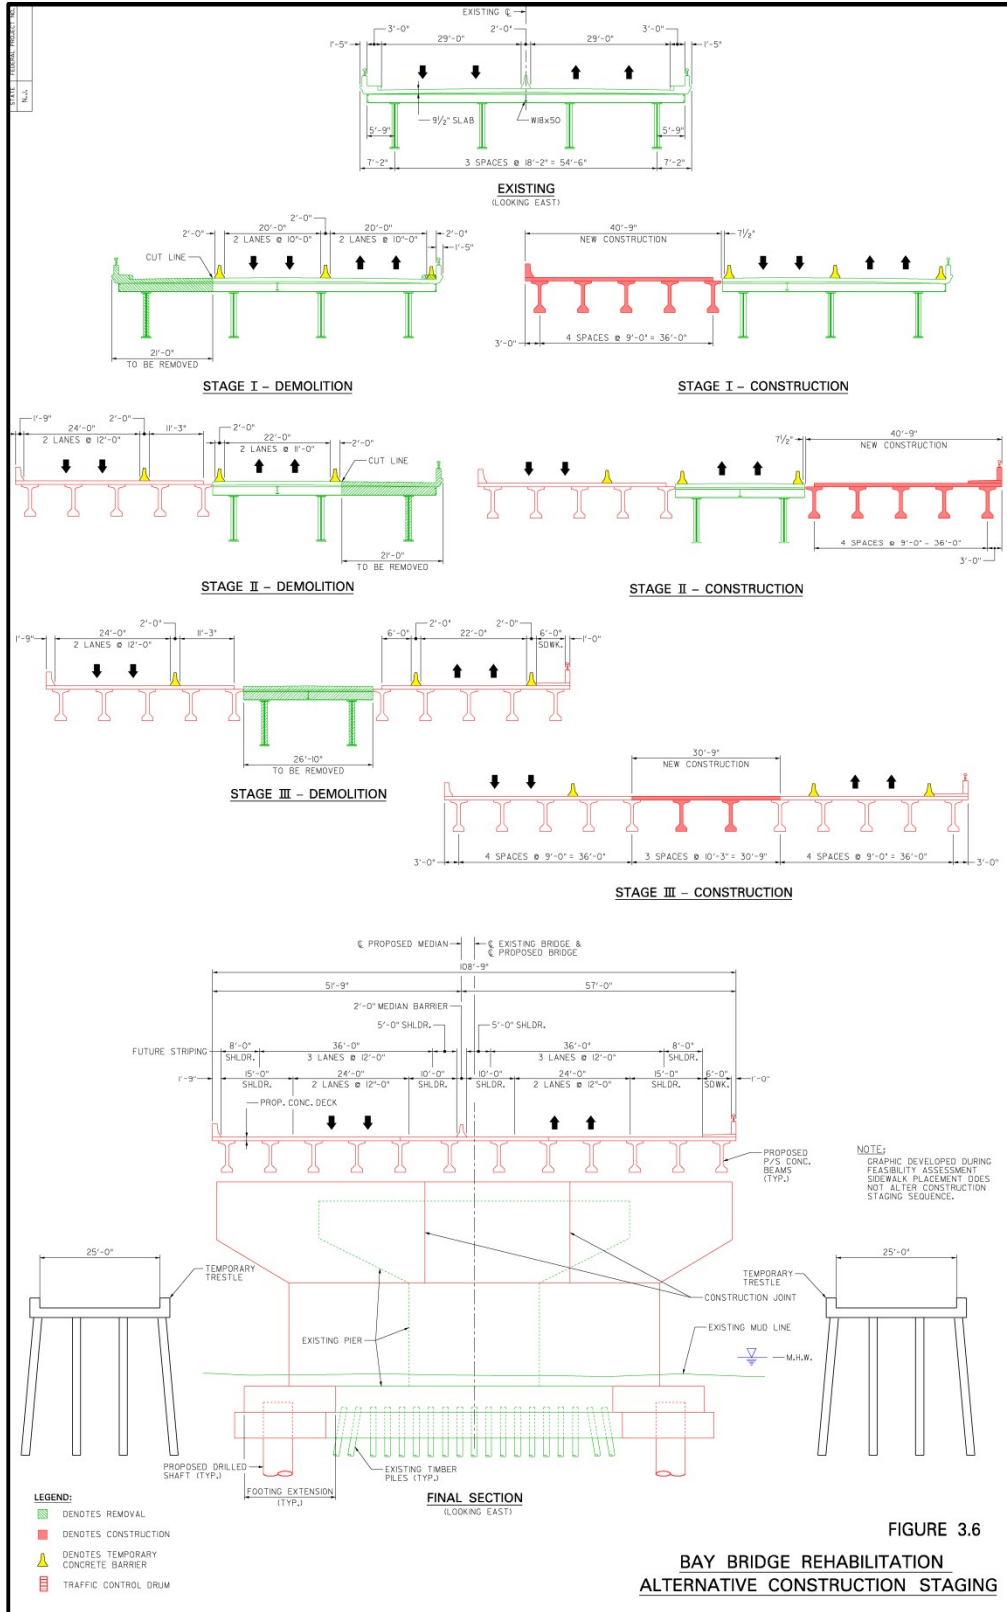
Bay Bridge Construction Staging (Alternative 1 – Rehabilitation)
